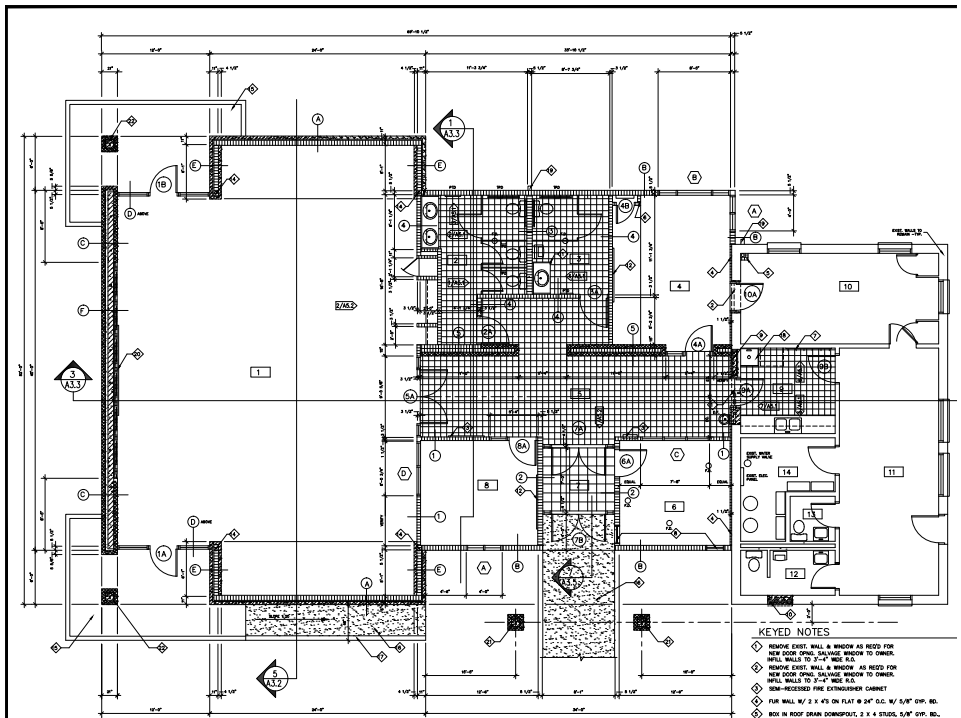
LONI Plan. From Waggoner and Wineinger Architects
